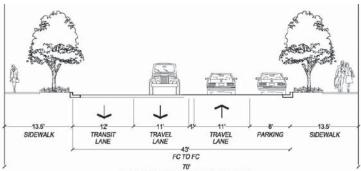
Recommended mid-block cross-section for 24th Street S. looking west between Crystal Drive and S. Clark/Bell Street
